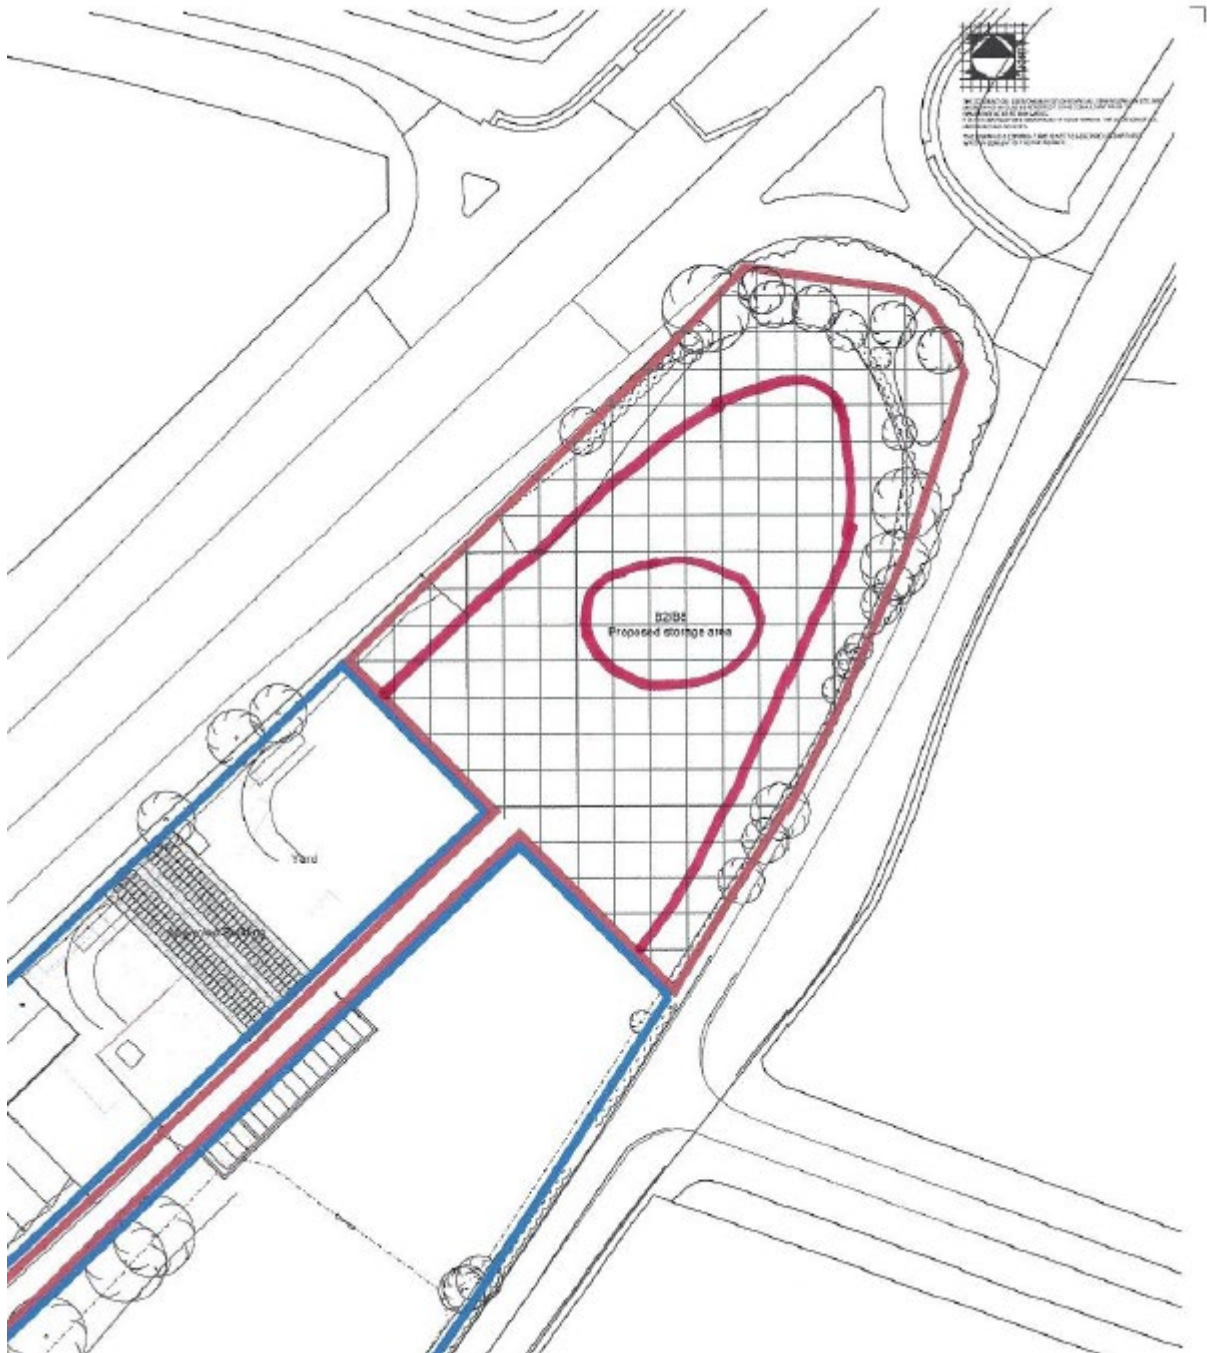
Proposed Site Plan: Site Masterplan (post-development). Close up of the proposed building and parking areas.
